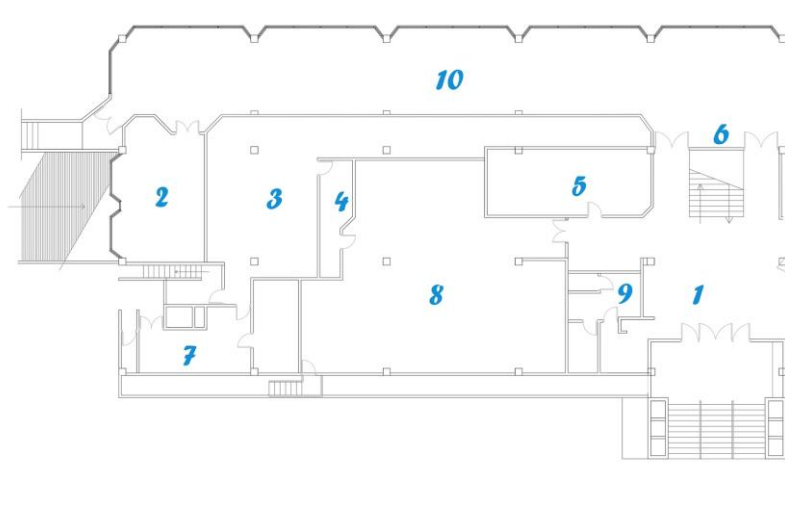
(a) Ground Floor Plan Layout (Measure Drawing Group 3 team, Teo 2017)
